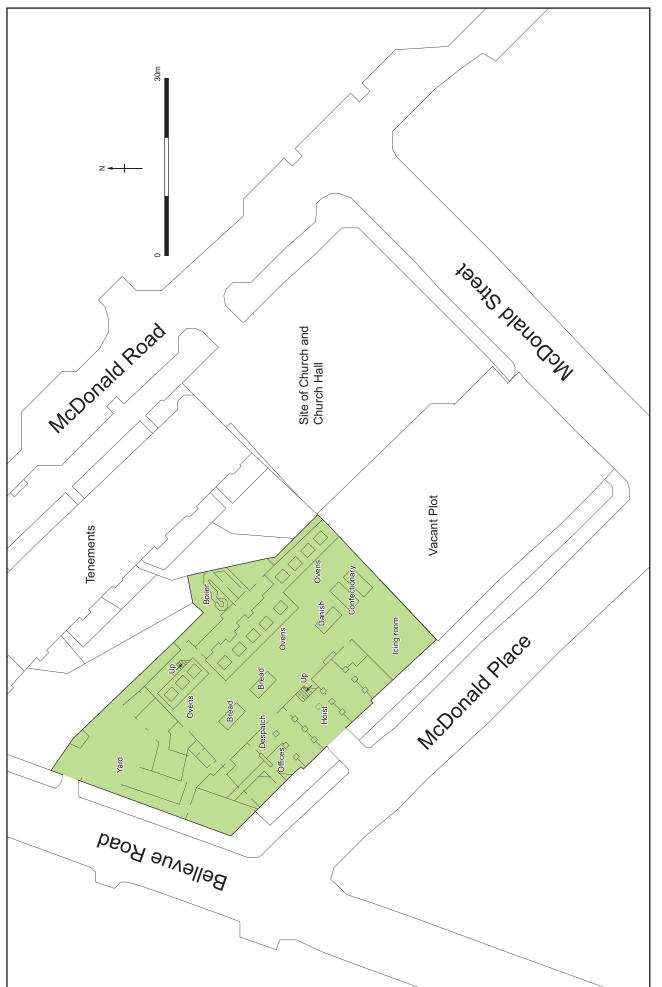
MDE07: Ground floor plan of Crawford's Bakery, 1930-1956.
